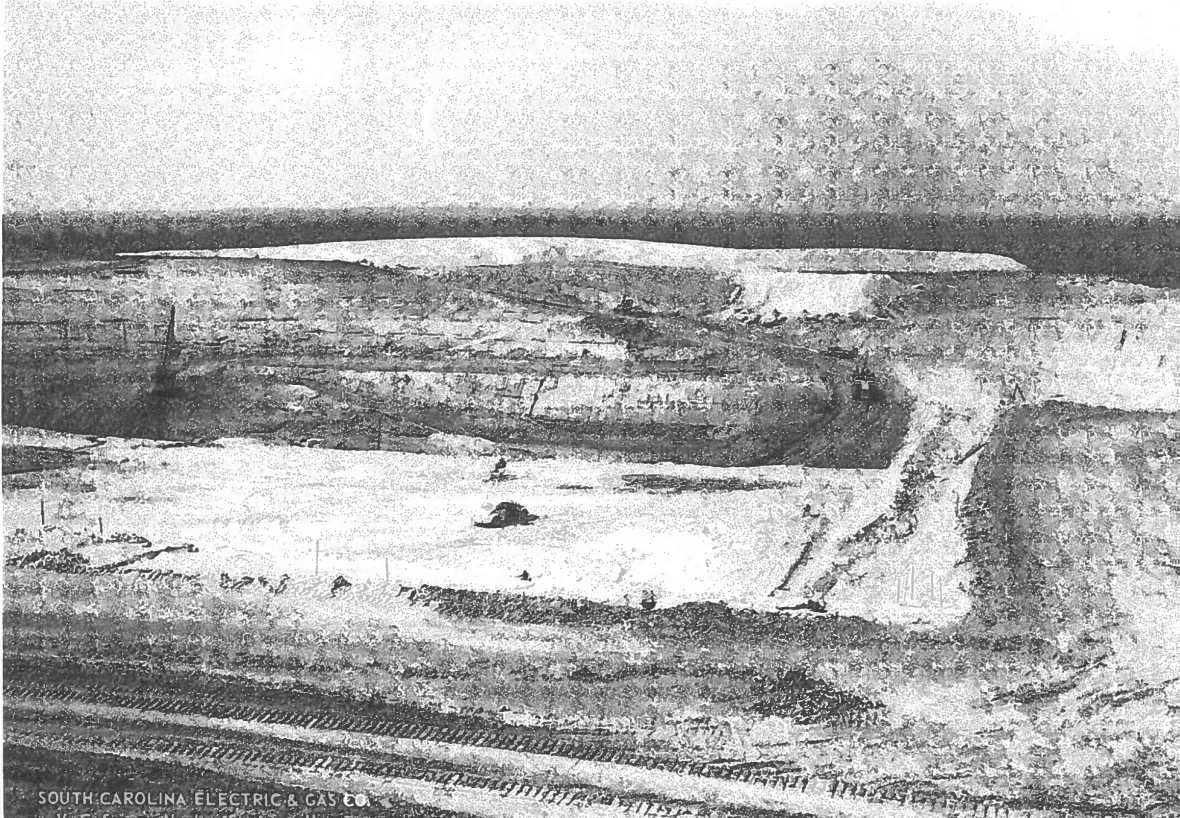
General Overview Construction Photograph of VCSNS Site During Construction, Showing Excavation and Disturbance, February 1974
